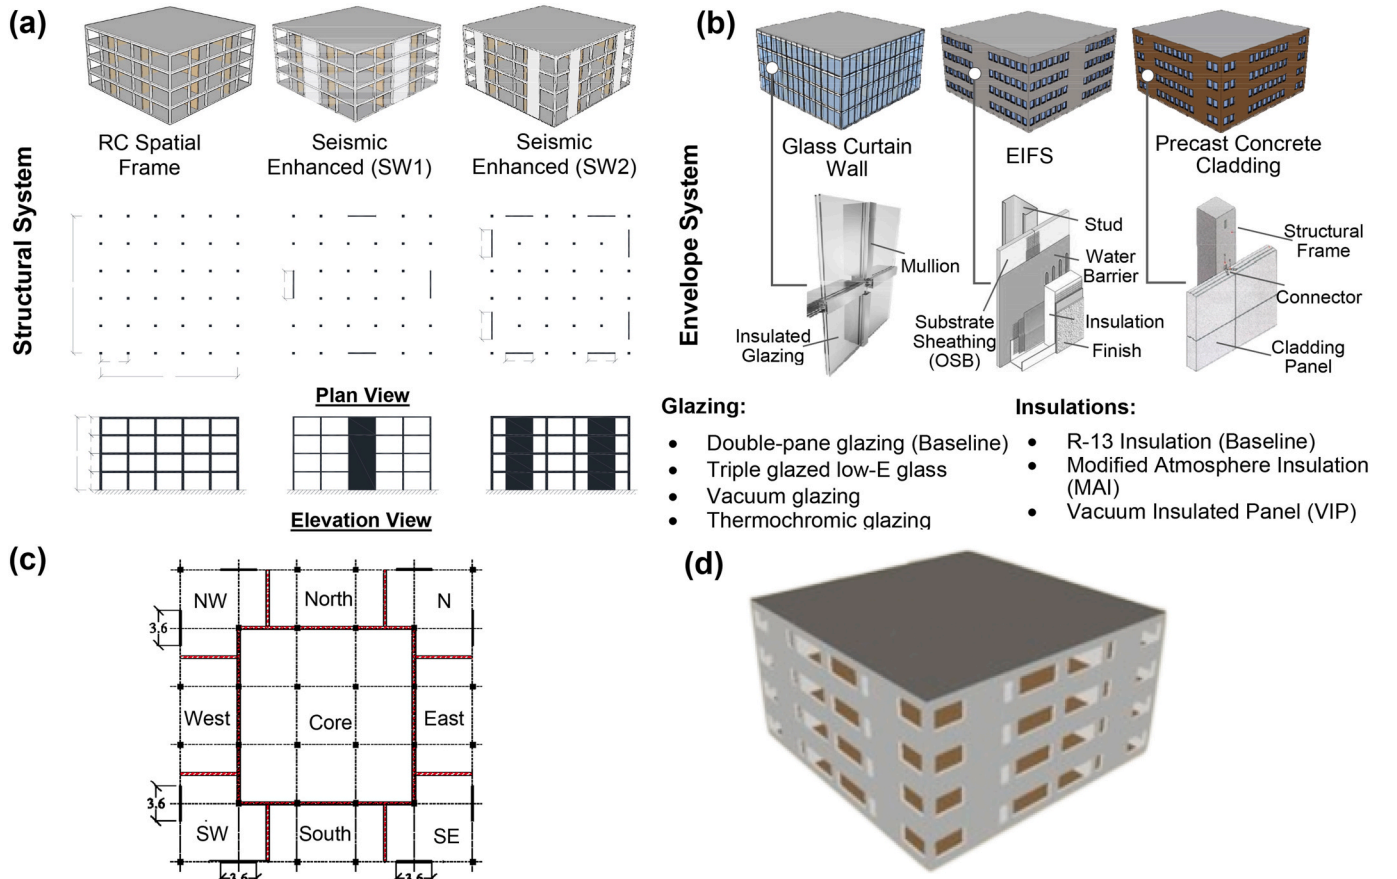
The (a) floor plans; (b) envelope types; and (c) thermal zones of building archetypes; and (d) EnergyPlus model.
